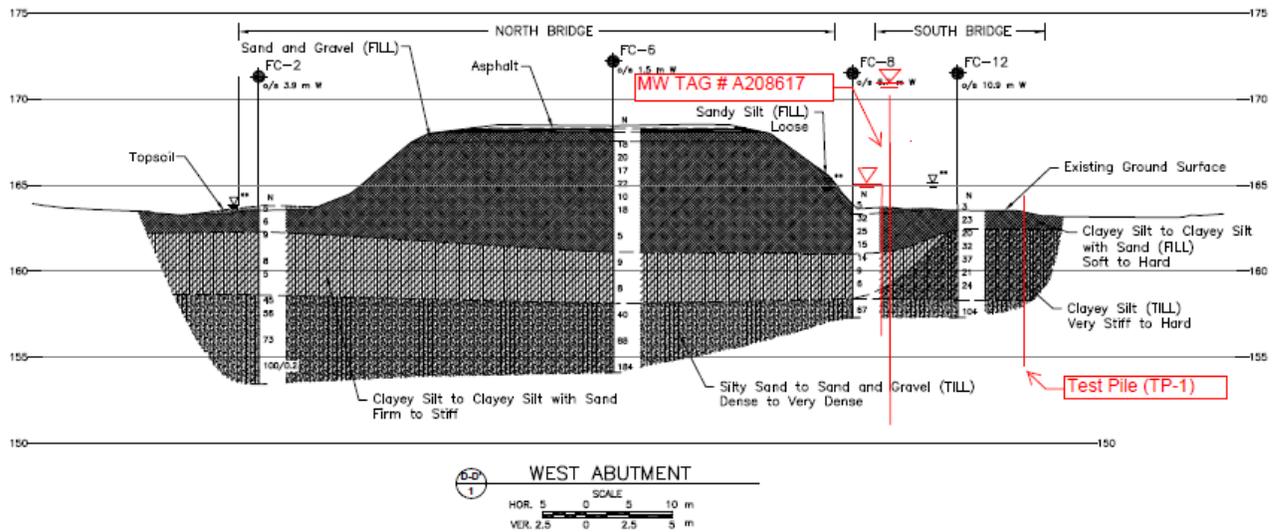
Site #1 - Typical subsurface section at the area of the test pile
